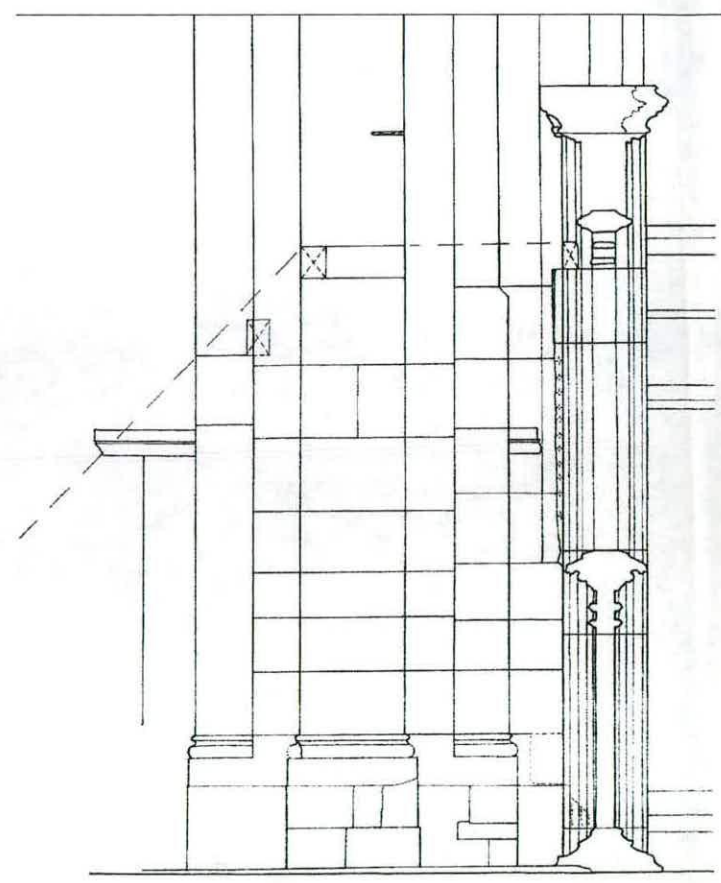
Drawn elevation of the west façade of the south aisle screen,
